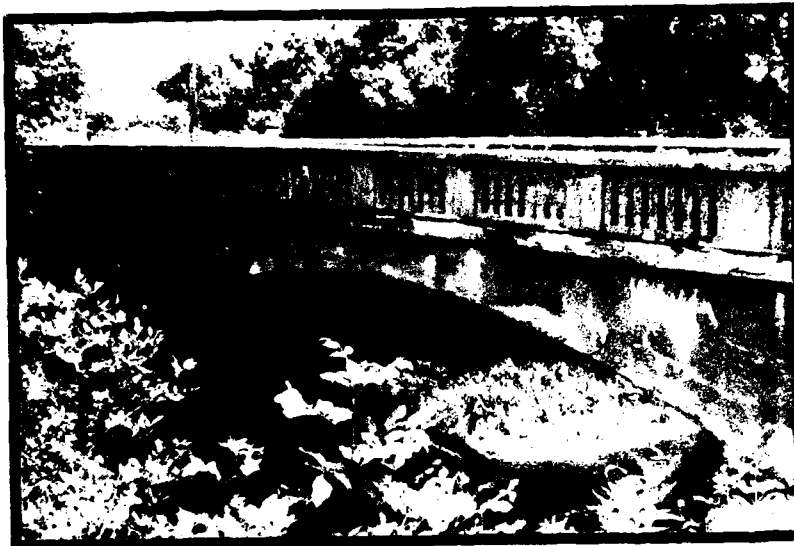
Farm Road bridge at mile 29.94. This bridge would be completely submerged by the Standard Project Flood.
